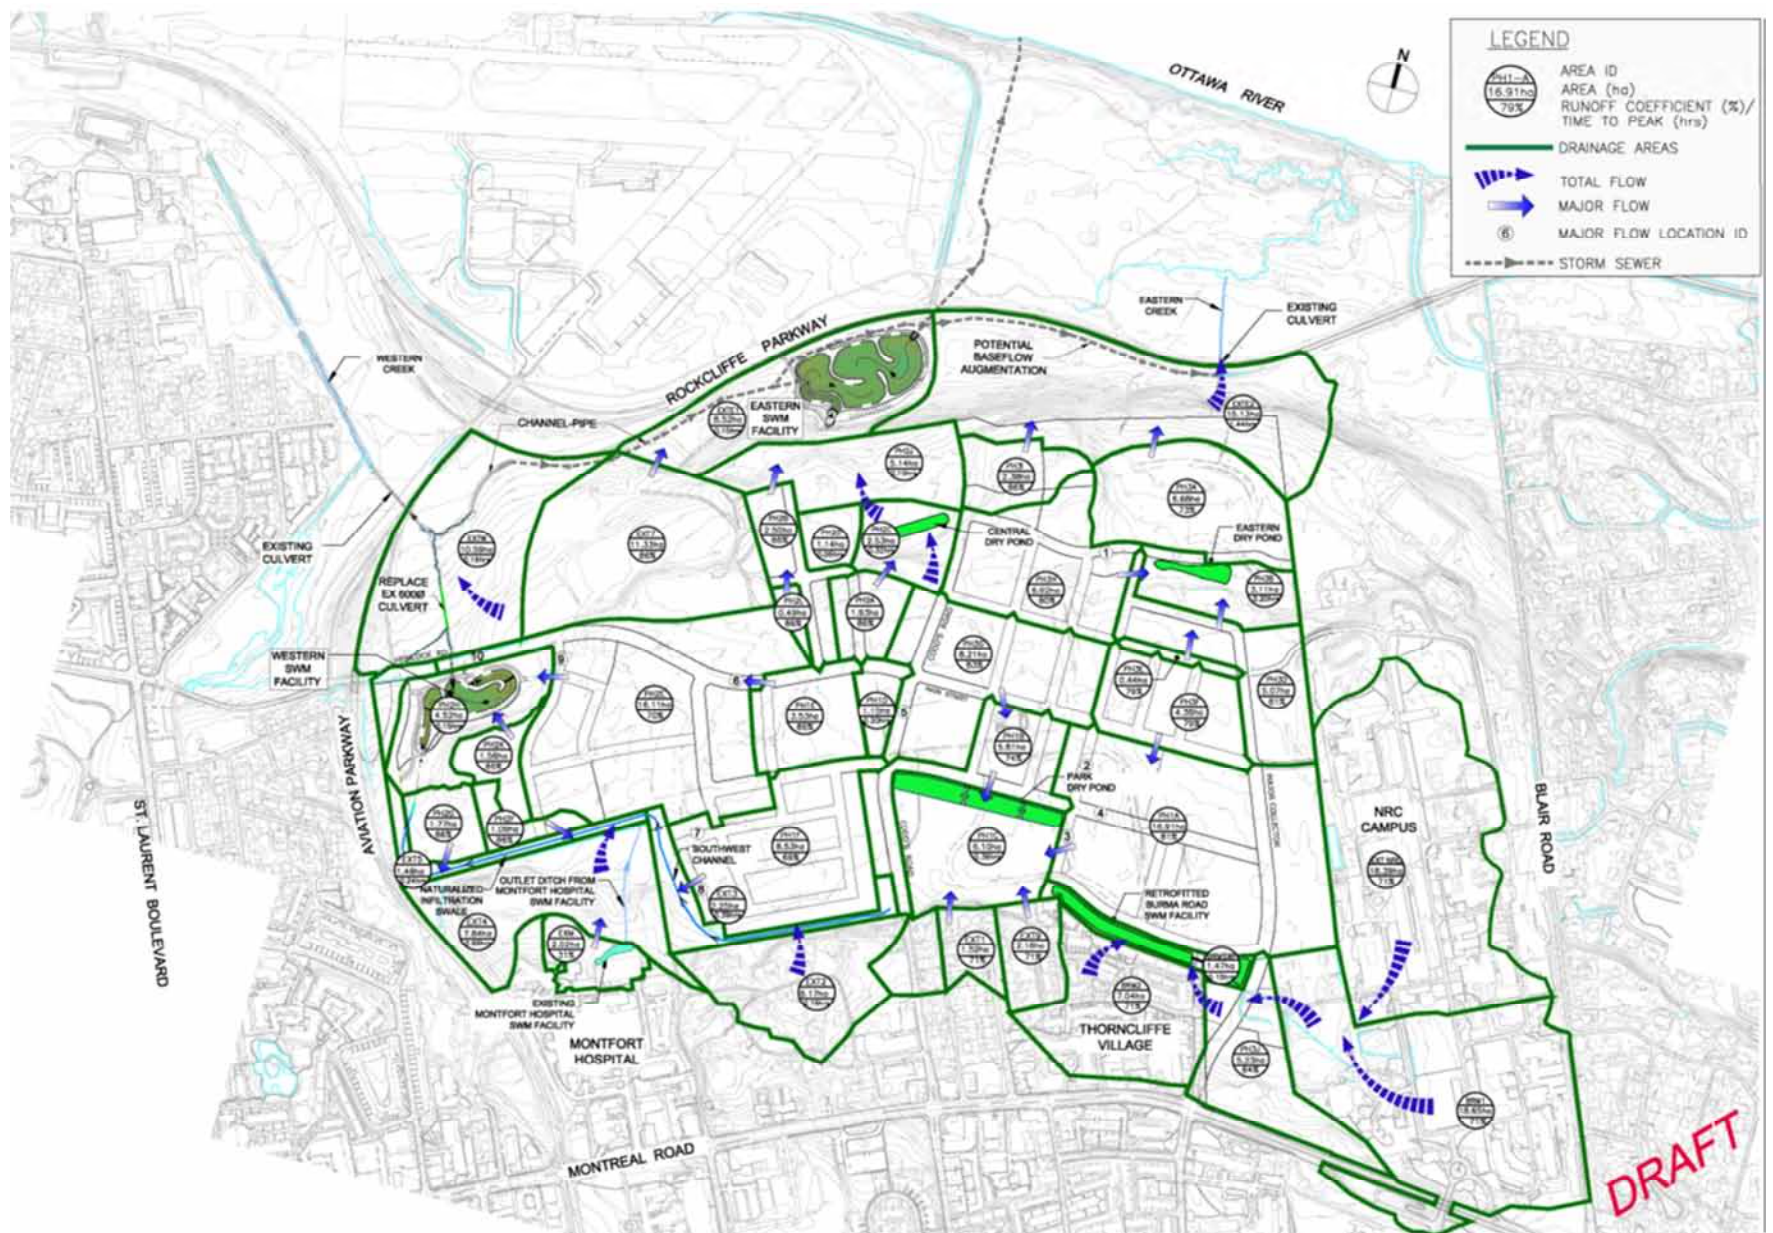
Post Development Conditions Drainage Area Plan – Major System Connectivity
